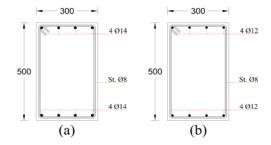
Mid-rise model beams: a) lower story beams, b) upper story beams (units in mm)
